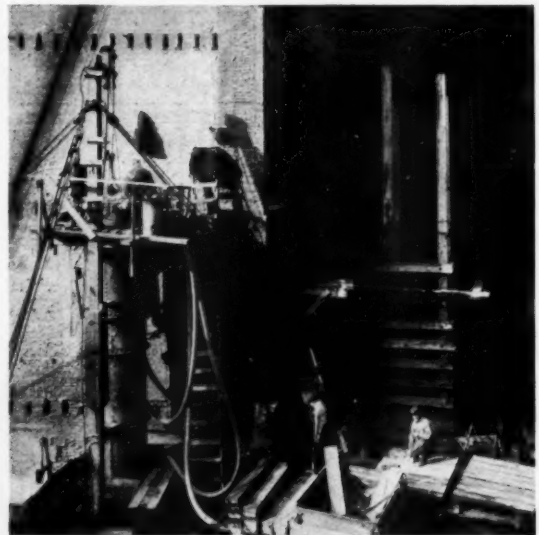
Air lock and caisson at corner of Beaver Street wing of the Welles Building
